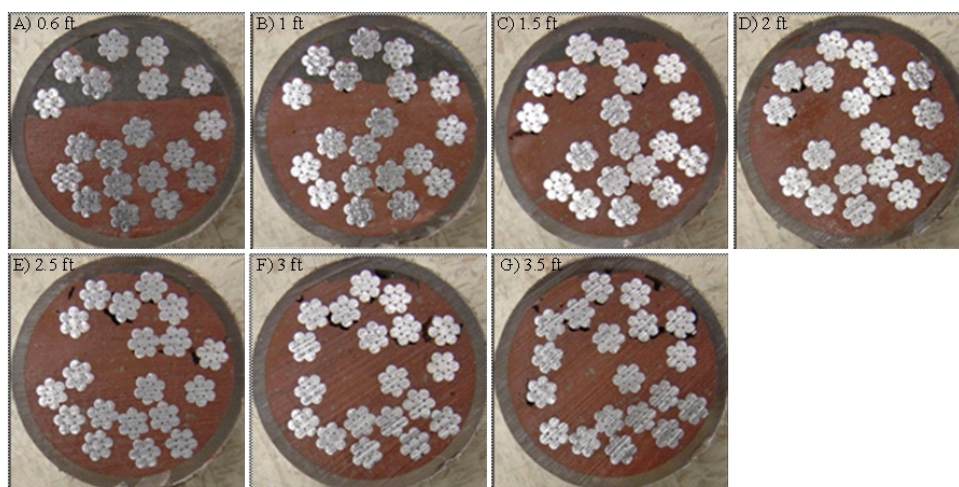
Cut Sections of Specimen PVG-C3-1 for the Filling Analysis of Repair Grout.
